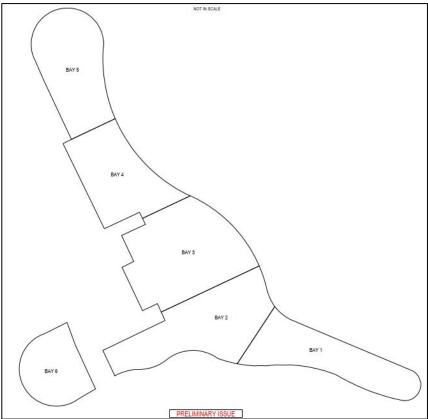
shows the planned layout of SWL1, which will be constructed as six bays with a total area of approximately 170,000 m<sup>2</sup>. Bays 1 to 5 will be separated by temporary coffer dams to facilitate construction.
